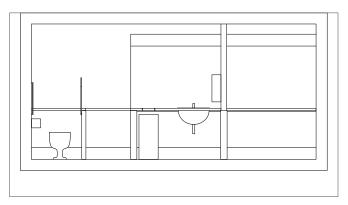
Washroom elevation *Diagram by: Ron Wickman Architect
